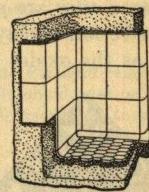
Square glazed wall tile, octagonal vitreous floor tile, separate cove at floor, and at internal angle. Quartered round at corner.
